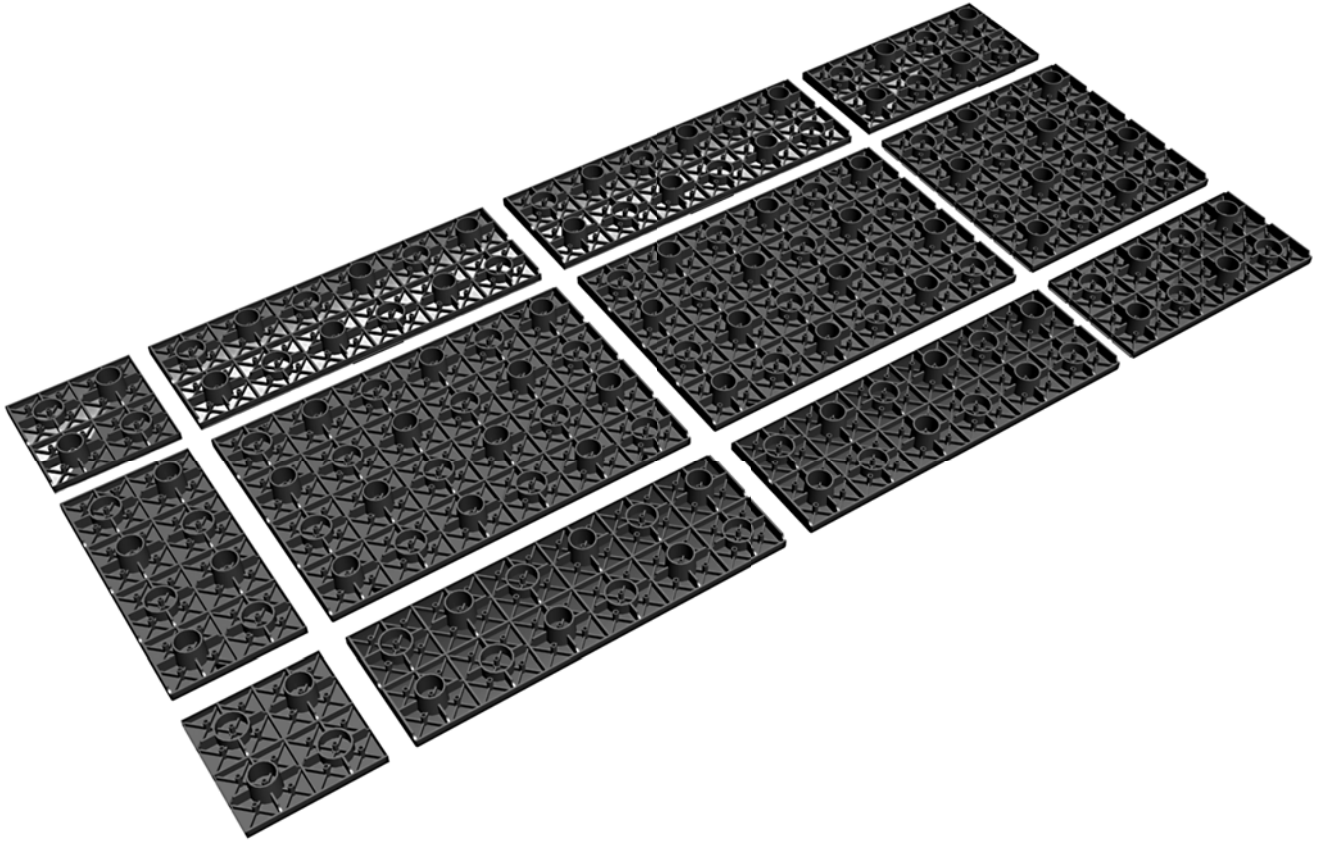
Exploded view of the lower panels for a 144" x 64" deck.
